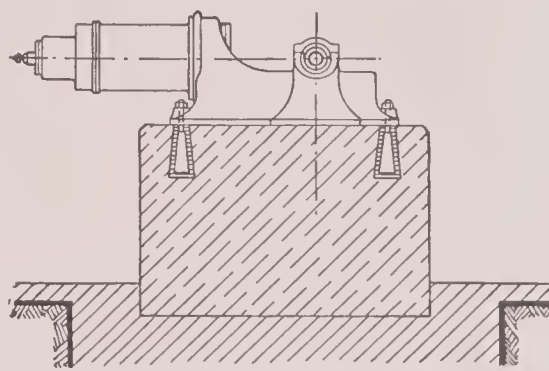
Horizontal Engine with Stone or Concrete Foundation.
